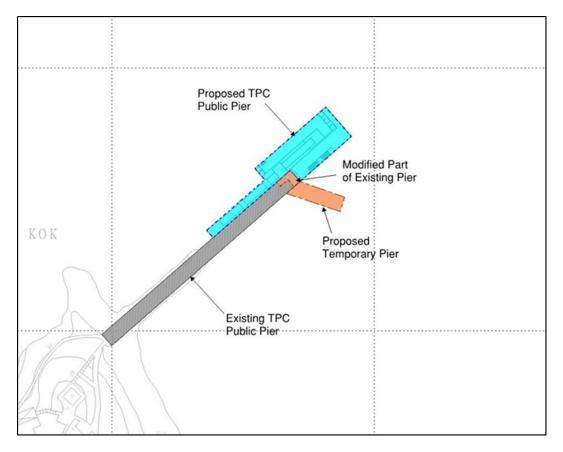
Location of Proposed TPC Public Pier and Proposed Temporary TPC Pier
